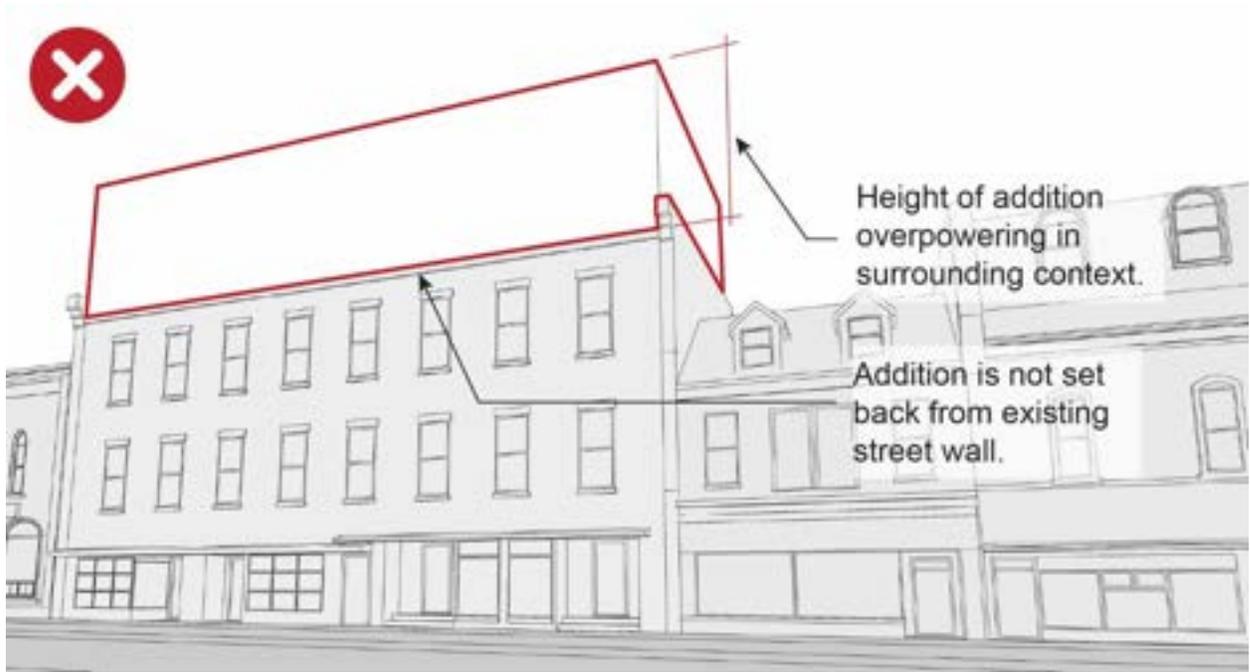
Incompatible height addition to contributing property in commercial core. The addition is not set back from the streetwall and is therefore overpowering in relation to its context. TRACE
